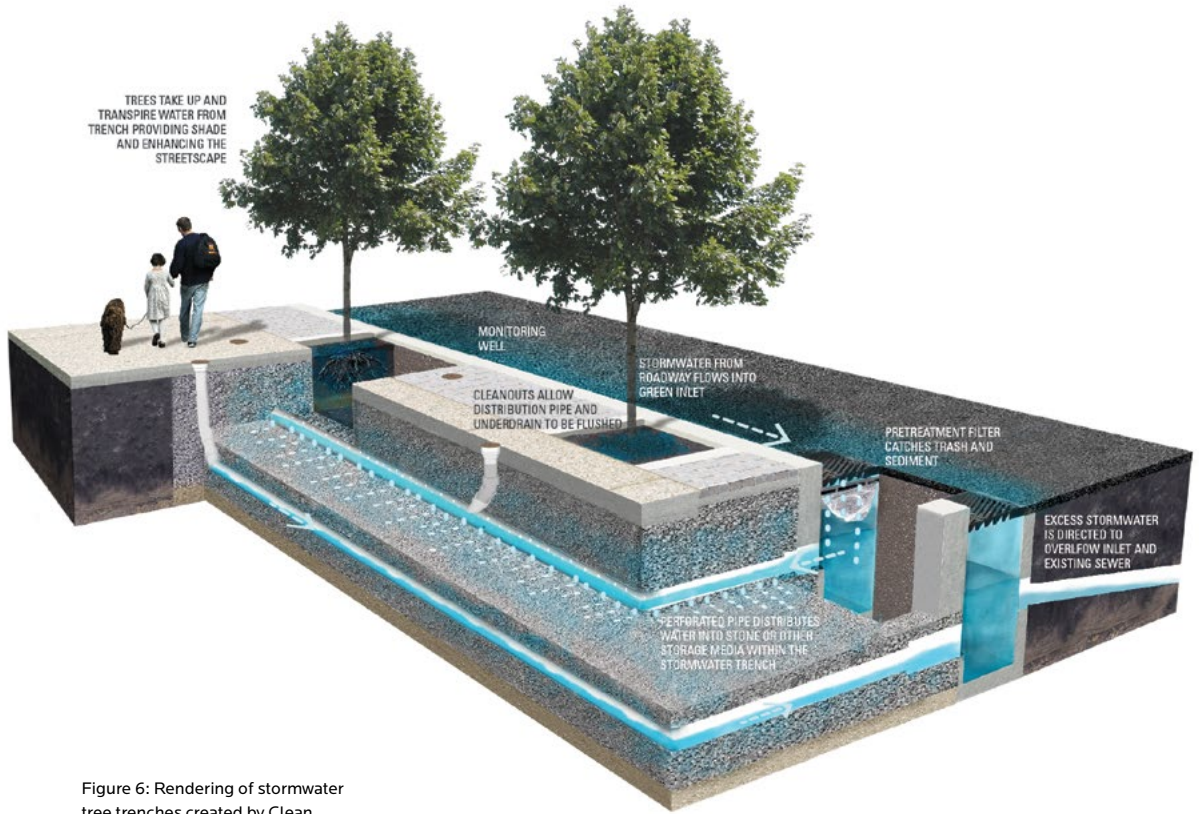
Rendering of stormwater tree trenches created by Clean Water, Green Cities Plan. Source: Philadelphia Water Department
